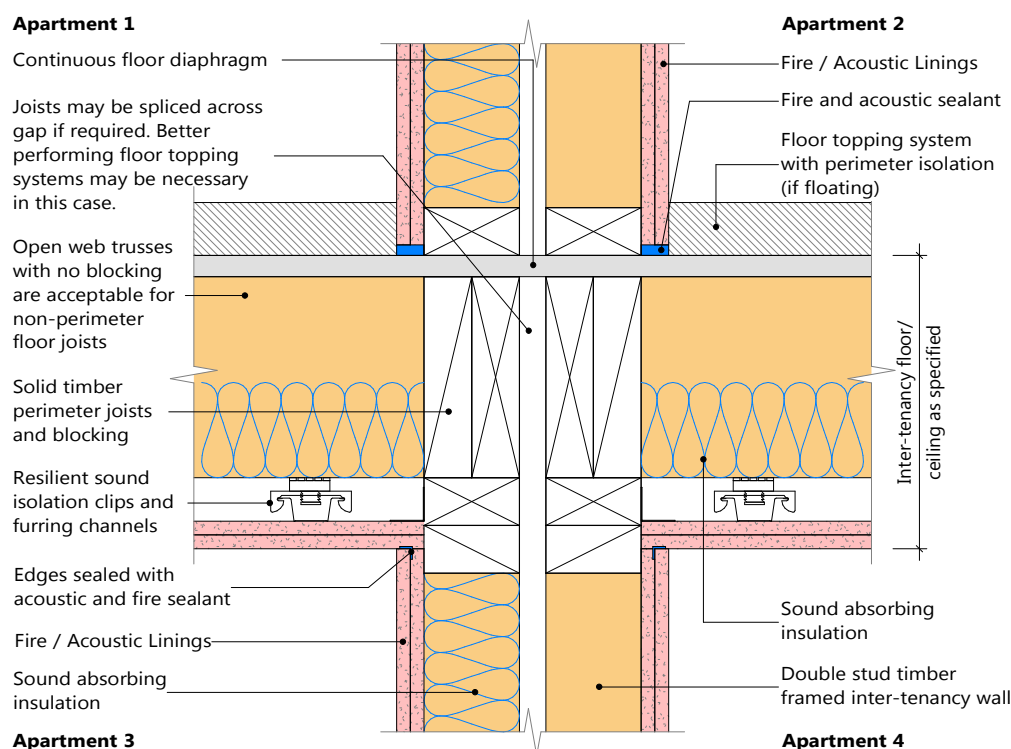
Floor junction detail with continuous diaphragm- joists perpendicular to inter-tenancy wall.
